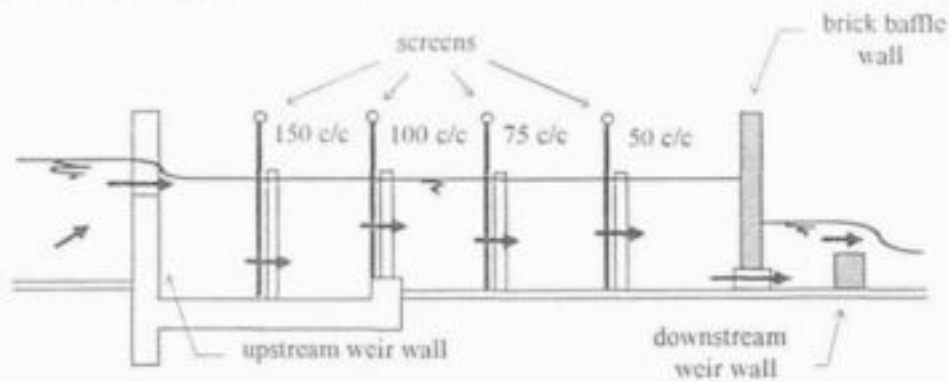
Plan of and section through the screens at the UWEM Pollution Control Works on the Robinson Canal, Johannesburg
